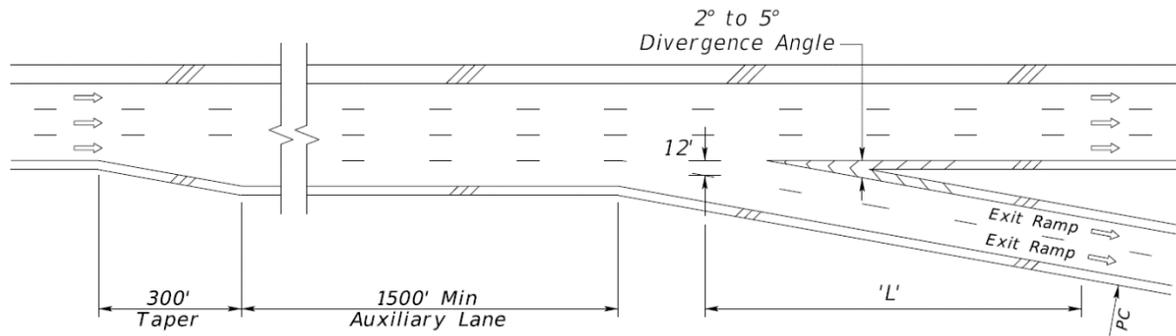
below shows a typical design for a taper type exit terminal.
